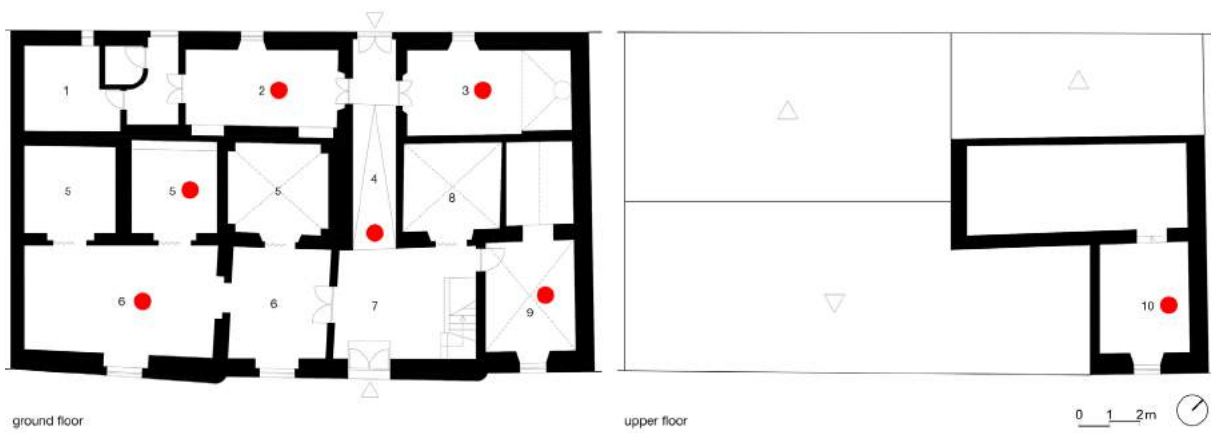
Floor plans showing the location of measuring instruments (1 – bathroom; 2 – kitchen; 3 – old kitchen (small living room); 4 – corridor; 5 – alcove; 6 – living room; 7 – entrance; 8 – library; 9 – bedroom; 10 - attic).
